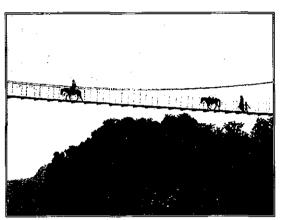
and 4.26 Partial View of the Carolina Hanging Bridge
